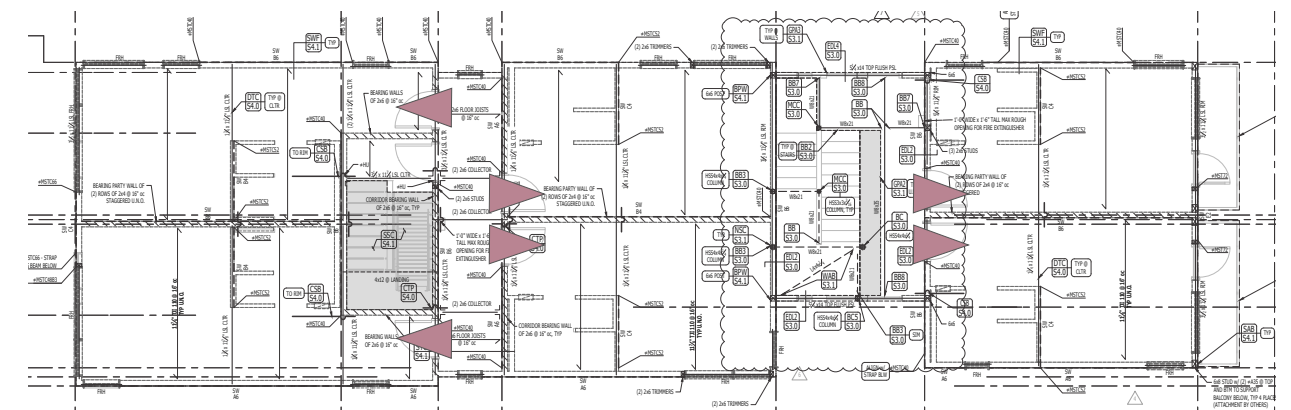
Upper level framing plan for 4011 Wallingford Ave N ("4011 Wallingford Ave N Structural Plans" 2023), overlaid with typical unit and access diagram.
